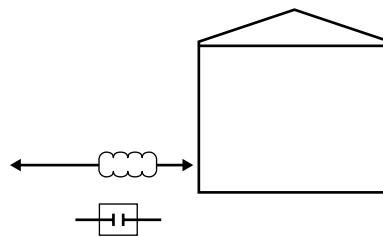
Flexible connection on a large bore pipe connected to a tank.
